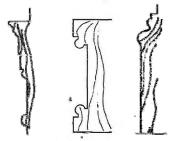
Section details. Profile of Upper Pilaster (left), cross-section of pilaster column (center) and profile of pilaster base (right).
